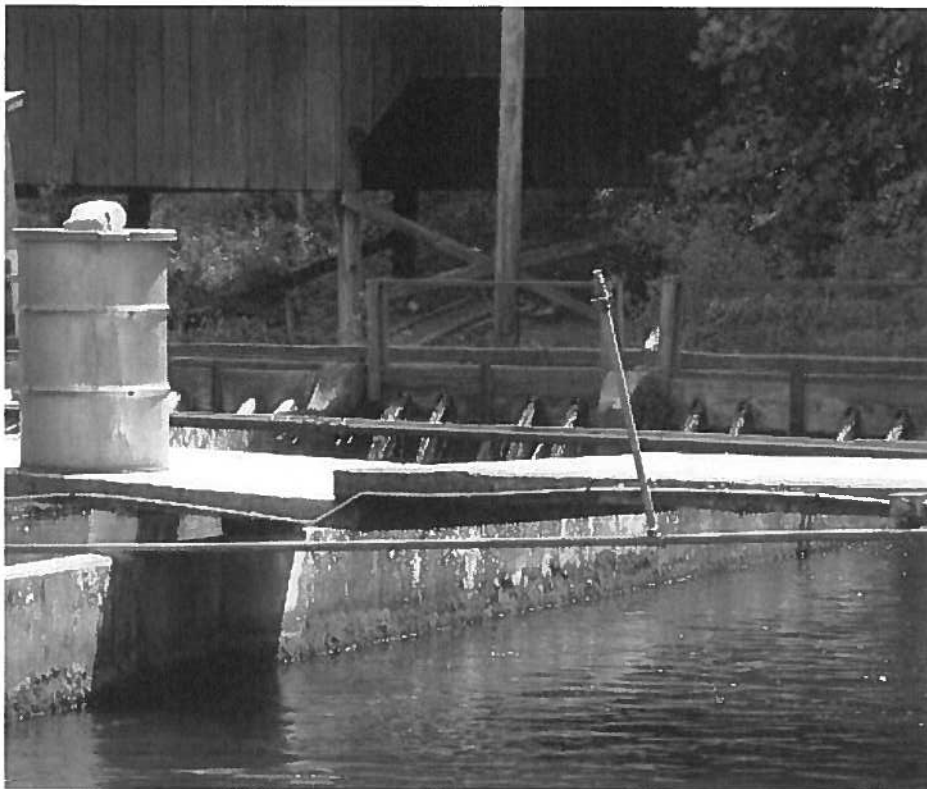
This 4-foot-wide reinforced concrete walkway adds to workers' safety when moving between raceways.
